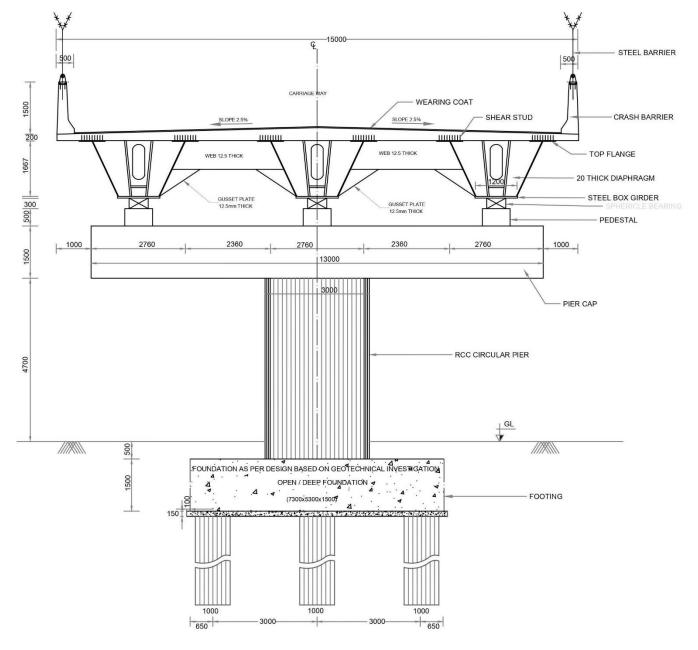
Sectional cross section of Trapezoidal box girder for 56m span
